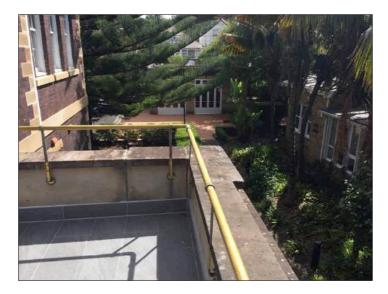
Showing the pipe railing and modern tiling on the northern porch at first floor level.
